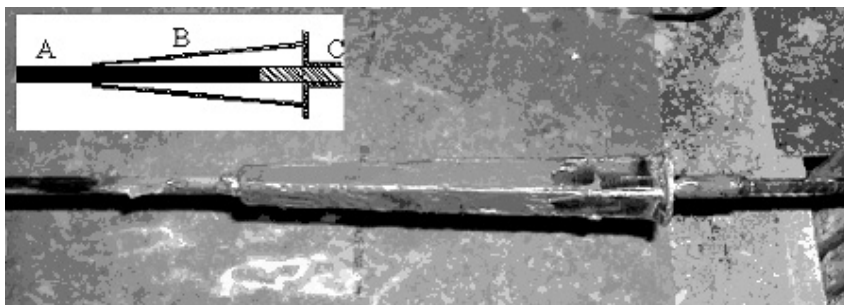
Details of the connection between CFRP and steel during pre-stressing, A) CFRP rod, B) steel cone filled with adhesive, C) steel bar welded to the cone
